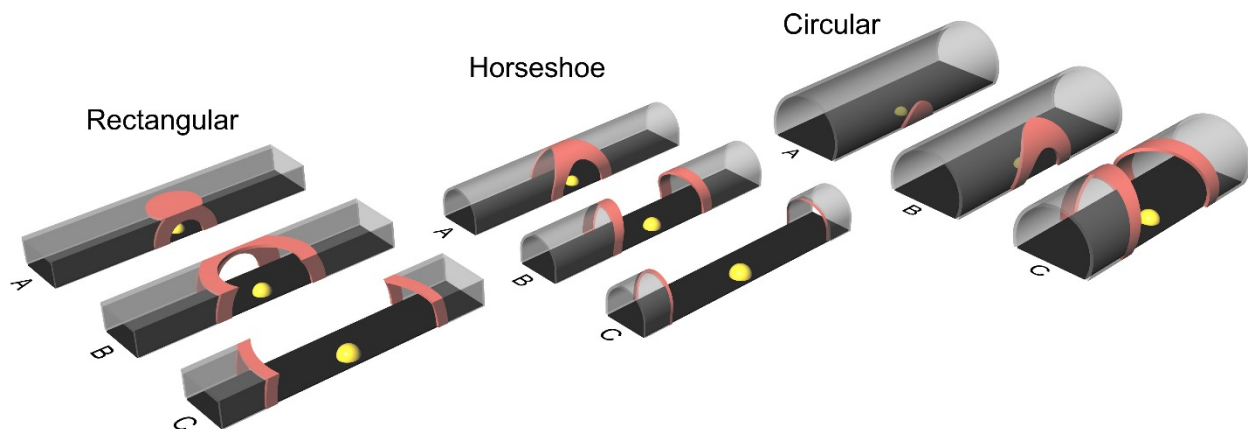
Tunnel spall and breach damage for threats A, B and C
